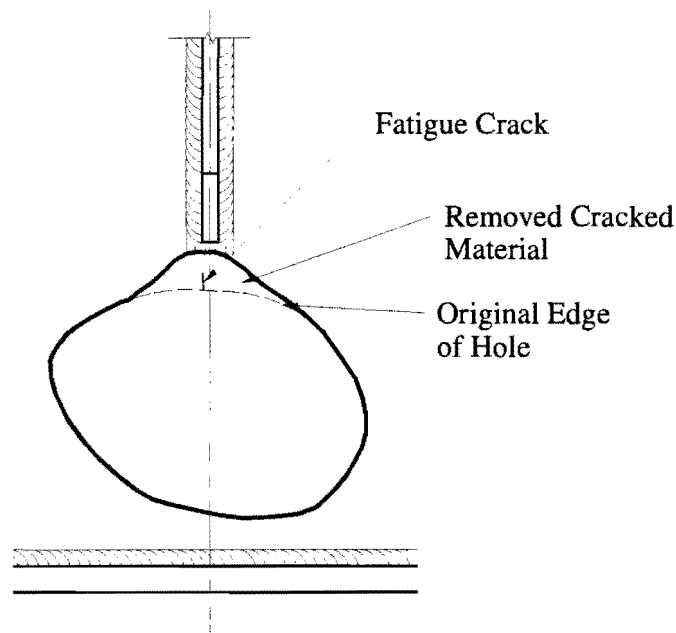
Flame-cut hole after repair of fatigue crack
